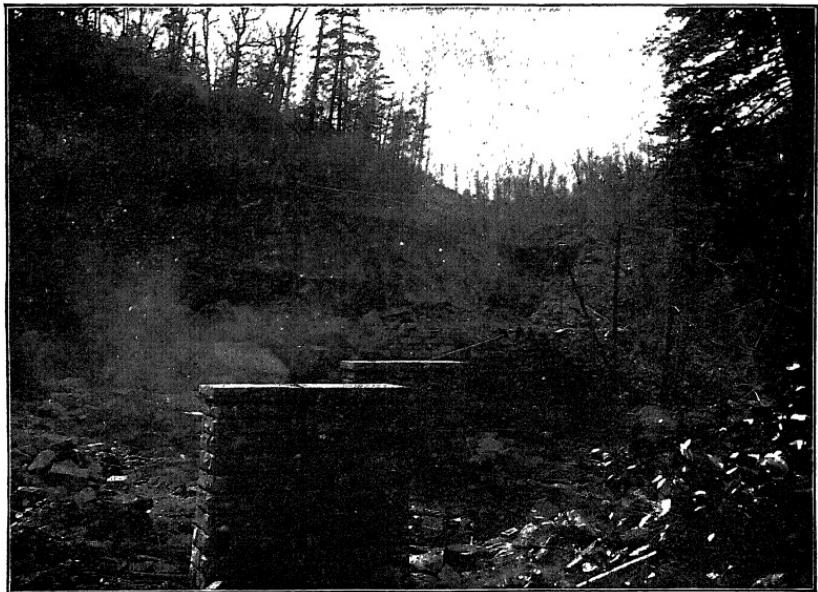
Masonry, and Rock Excavation, Hickory Creek Crossing No. 7. Looking South.
